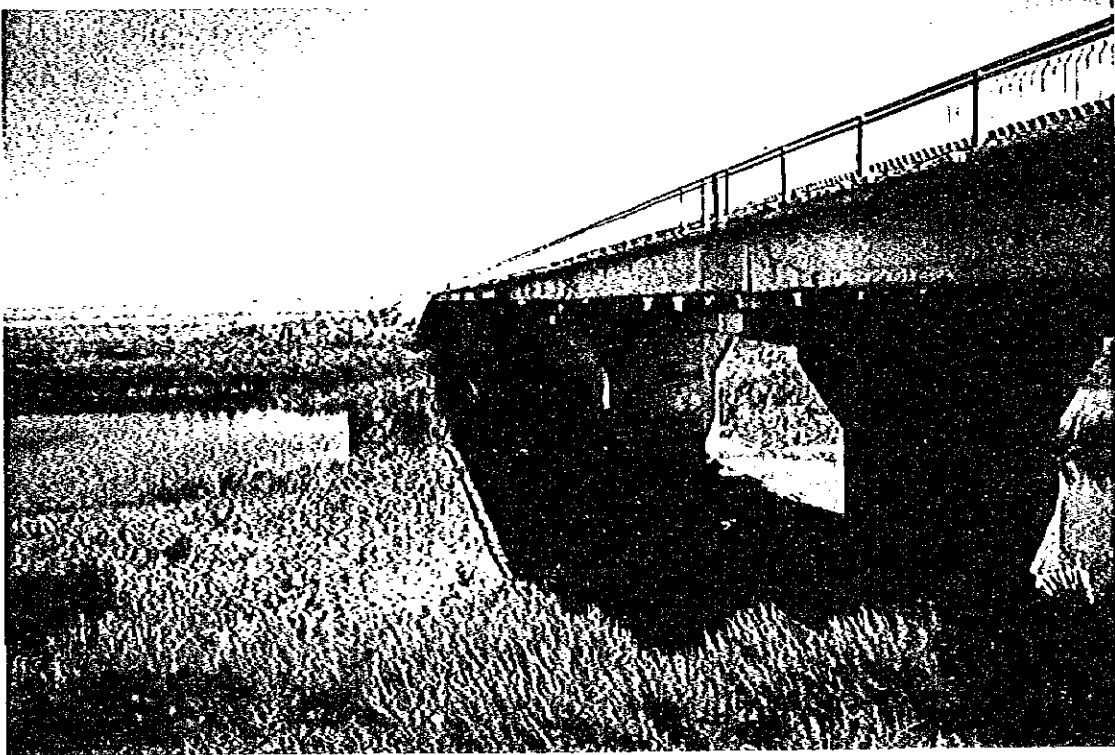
Bridge No. 28 (Kzyl-Orda Border to Irgiz)
